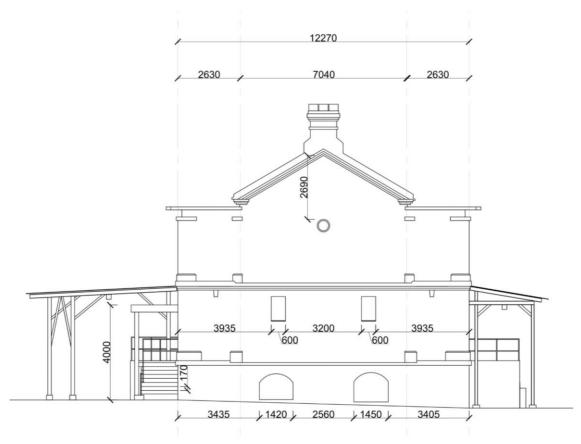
West façade, nowadays. (Source: Architectural Services Department)
